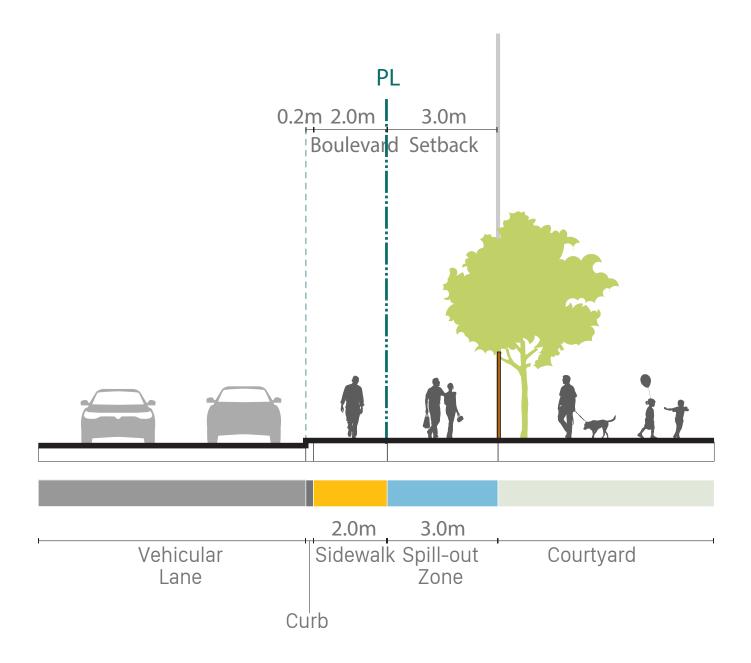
Section at interface of Central Plaza on Subject Site and Clair Road East (Courtesy of SvN Architects + Planners)
